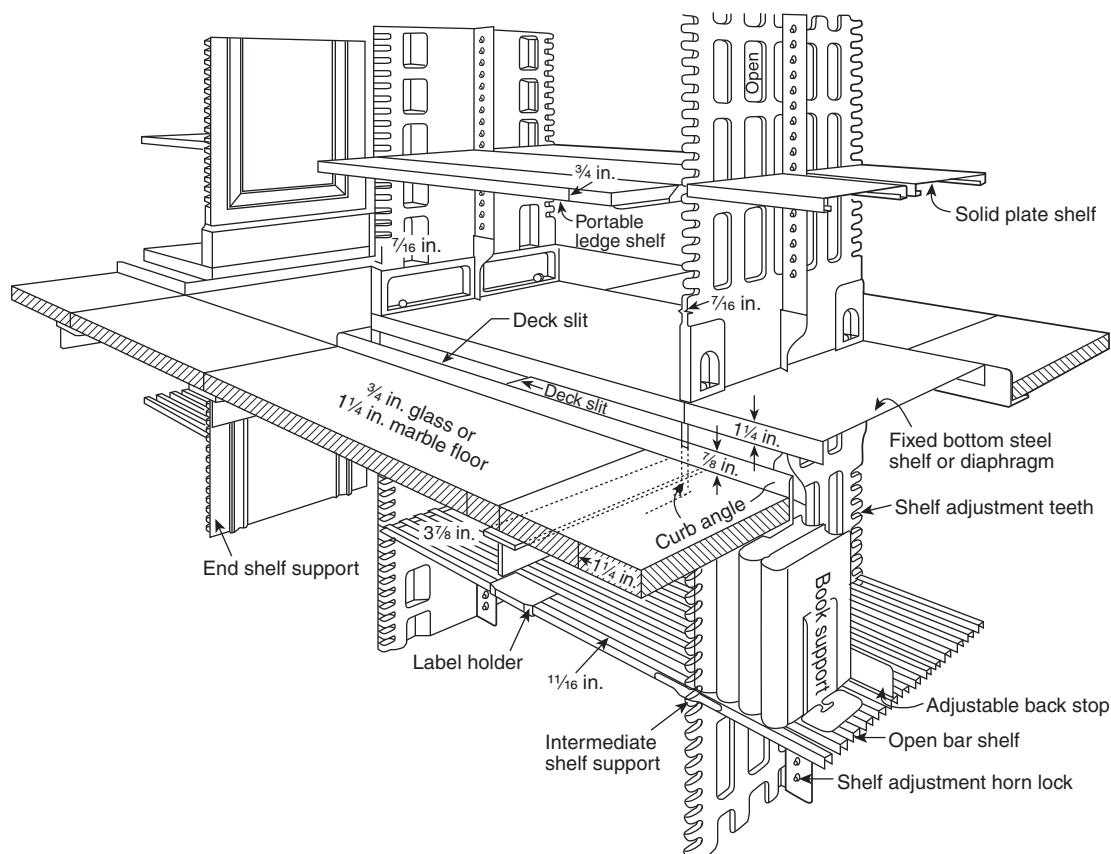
(b) Perspective Detail of Multi-tier Book Stack Showing Section Through Deck Flooring, Fixed Bottom Shelf, and Adjustable Shelves. (Note: For SI units, 1 in. = 25.4 mm.)
